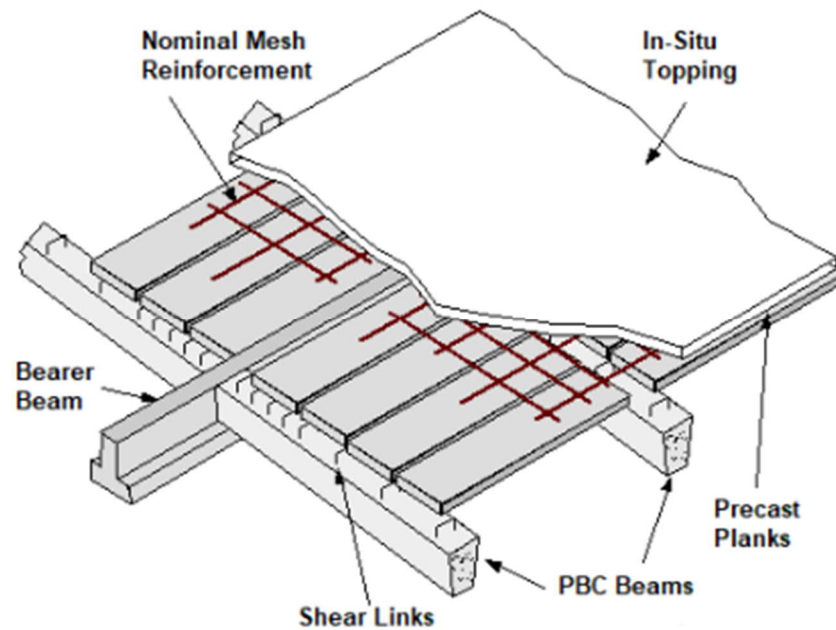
Beam and plank slab (The Concrete Centre, 2017)
